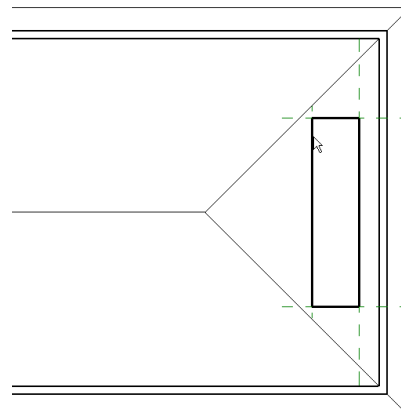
Sketching the opening in the ceiling plan using the reference planes
